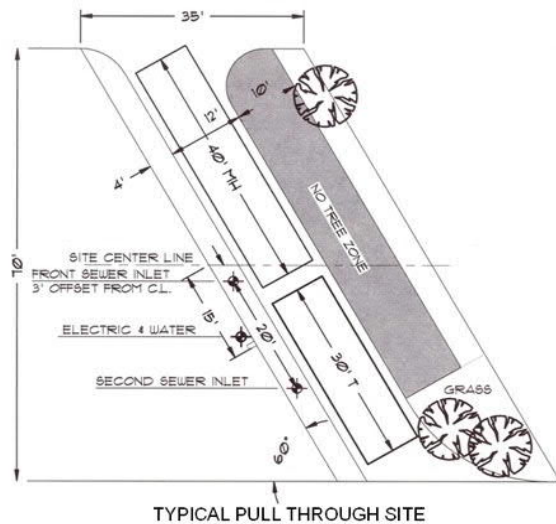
Campground Typical RV Site Pull Through Detail
